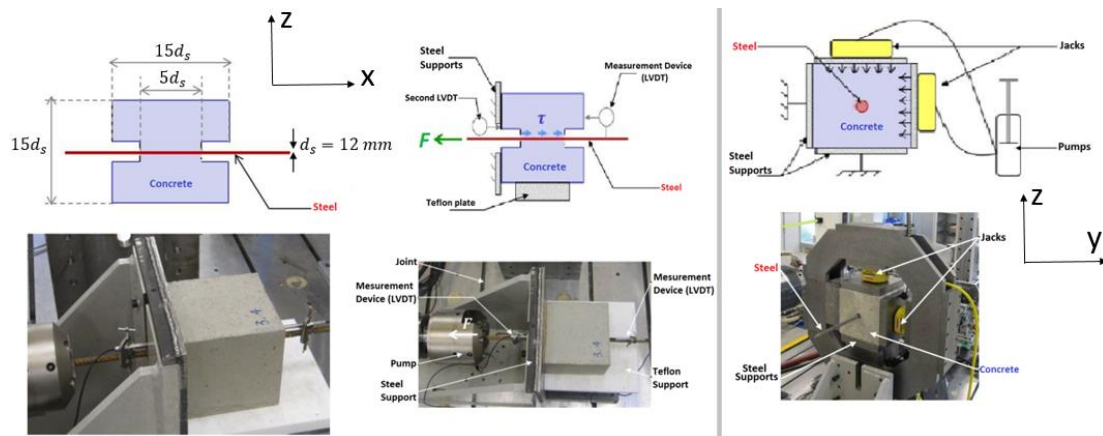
Pull-out test setup and specimen geometry (Torre-Casanova, Jason, et al. 2013).
